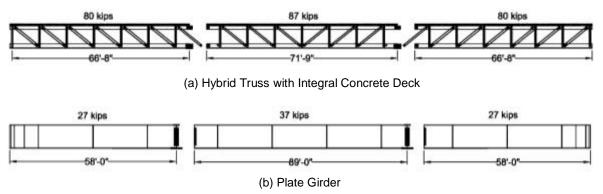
Weight of Each Splice Section for the (a) Hybrid Truss with Integral Concrete Deck and (b) Plate Girder
